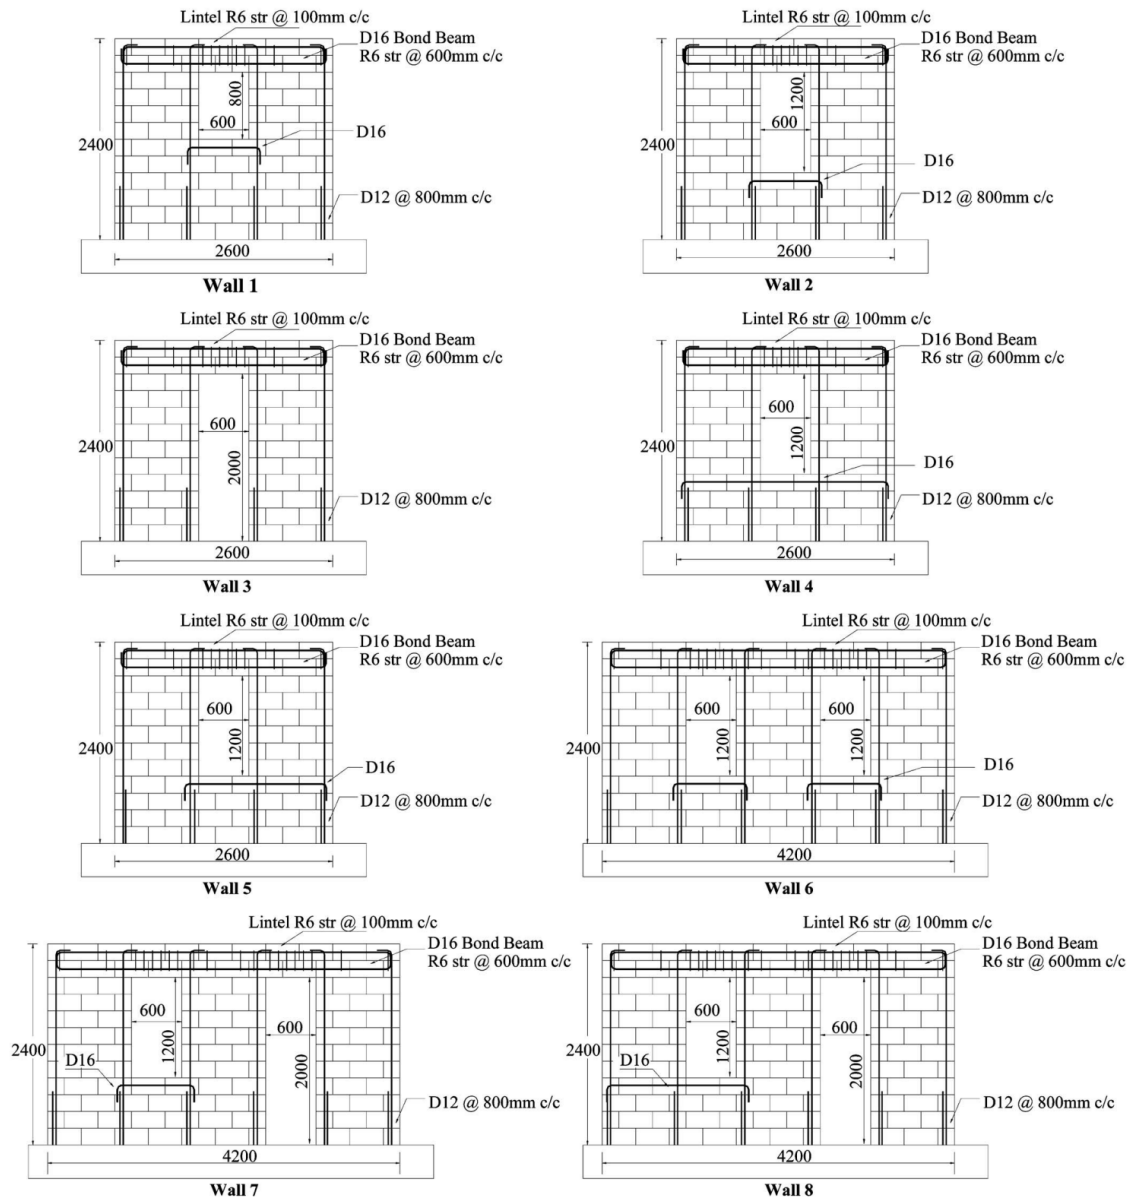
Masonry Wall Specimens (Voon and Ingham, 2008)
